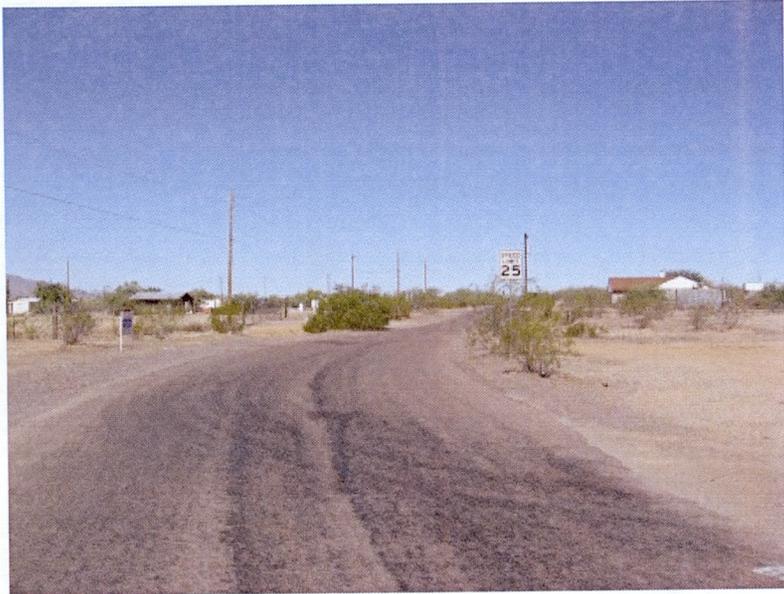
At the intersection of the field location of Beacon Field Blvd. and Norwich Drive looking west along Norwich Drive.
